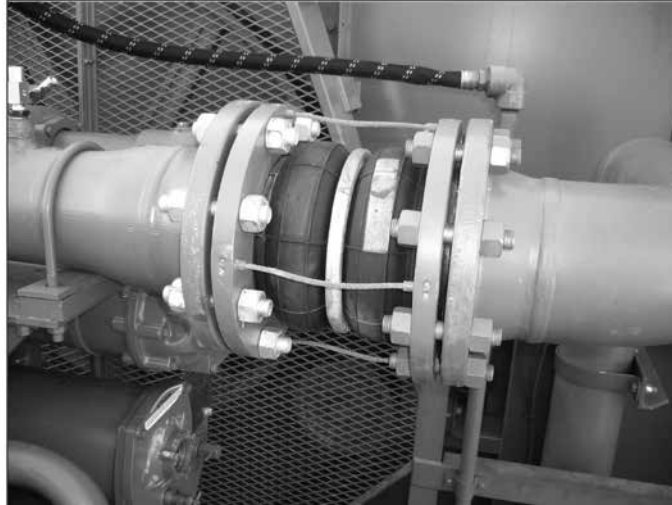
Example of Flexible Coolant Piping Coupling With Ground Straps
